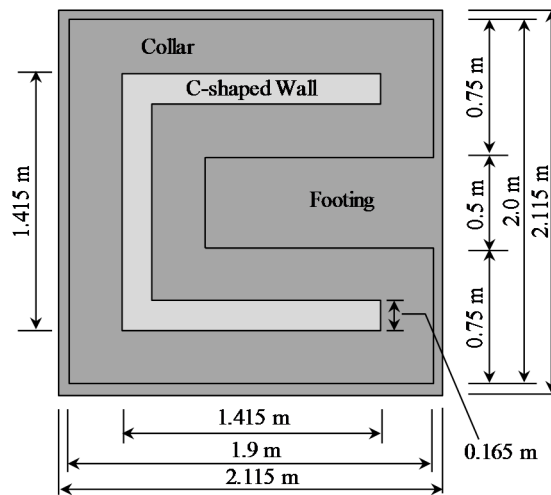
Plan view and C-shaped wall dimensions (Mechmachi and Bouaanani, 2018)
